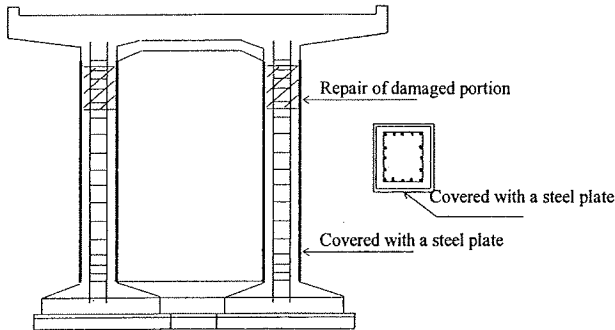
(a) Diagram of the Restoration of a Rigid-Frame Bridge (Class A, B)
